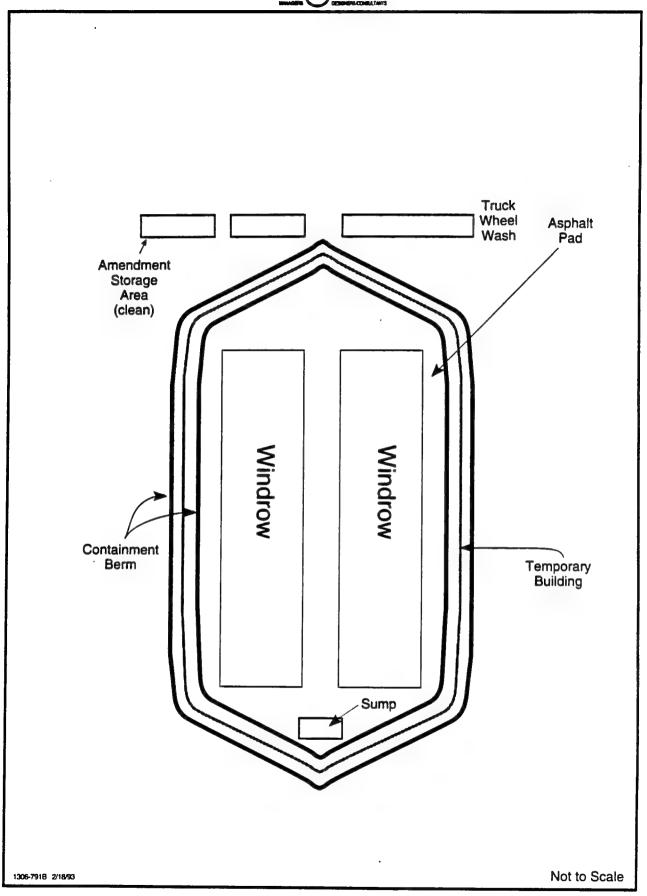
SITE LAYOUT FOR WINDROW FACILITY
